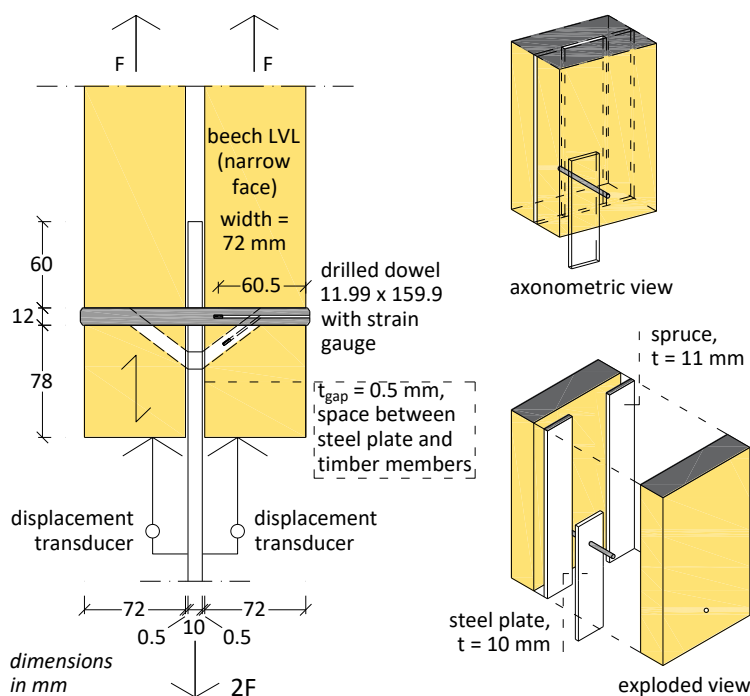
Test setup for shear tests. Left: cross section; top right: axonometric view; bottom left: exploded view.
